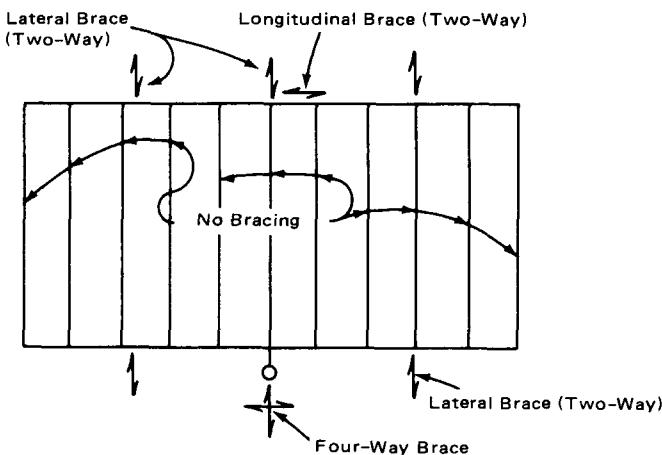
(c) Typical location of bracing on a gridded system.
